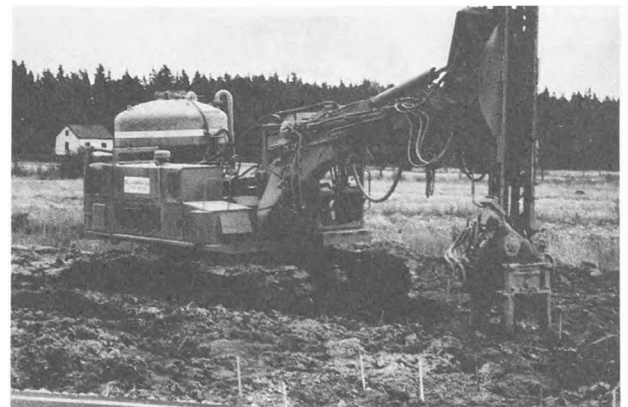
Column stabilization equipment along Highway 1 in Finland.
